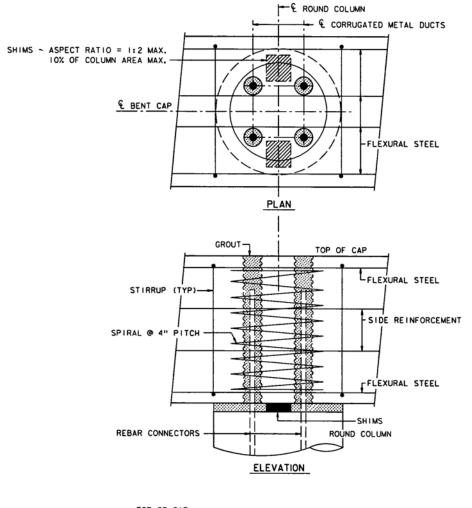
Double-line Grout Pocket on Column (Surface-flush Option)
